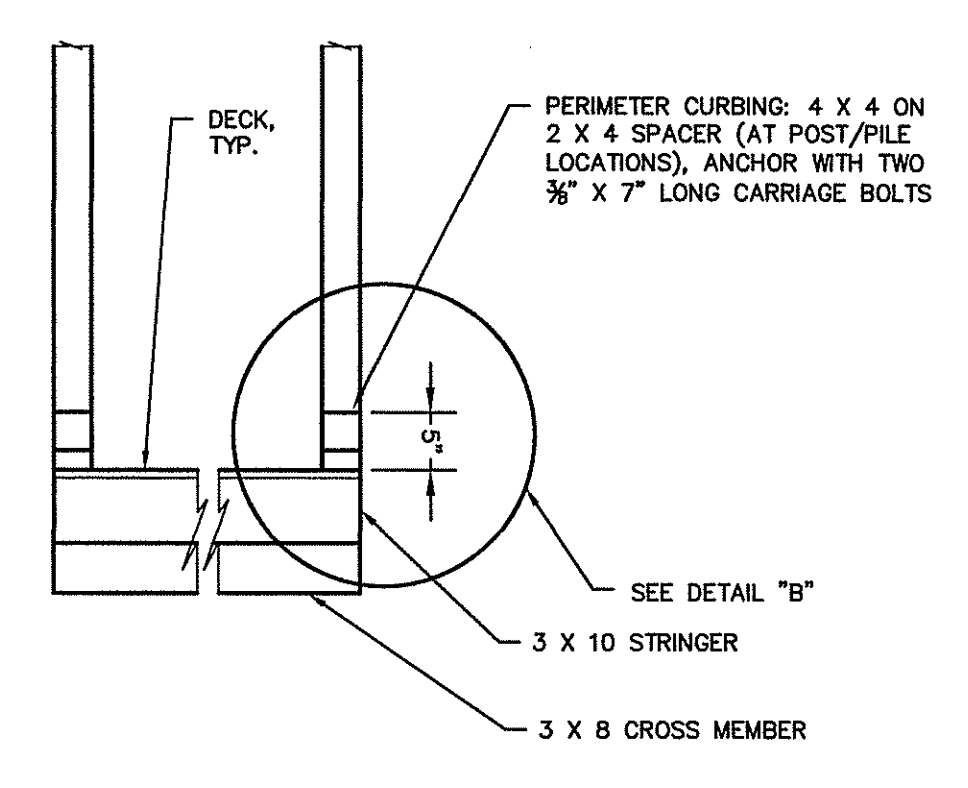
DETAIL BOARDWALK SECTION FOR WALKOVER STRUCTURE #1
